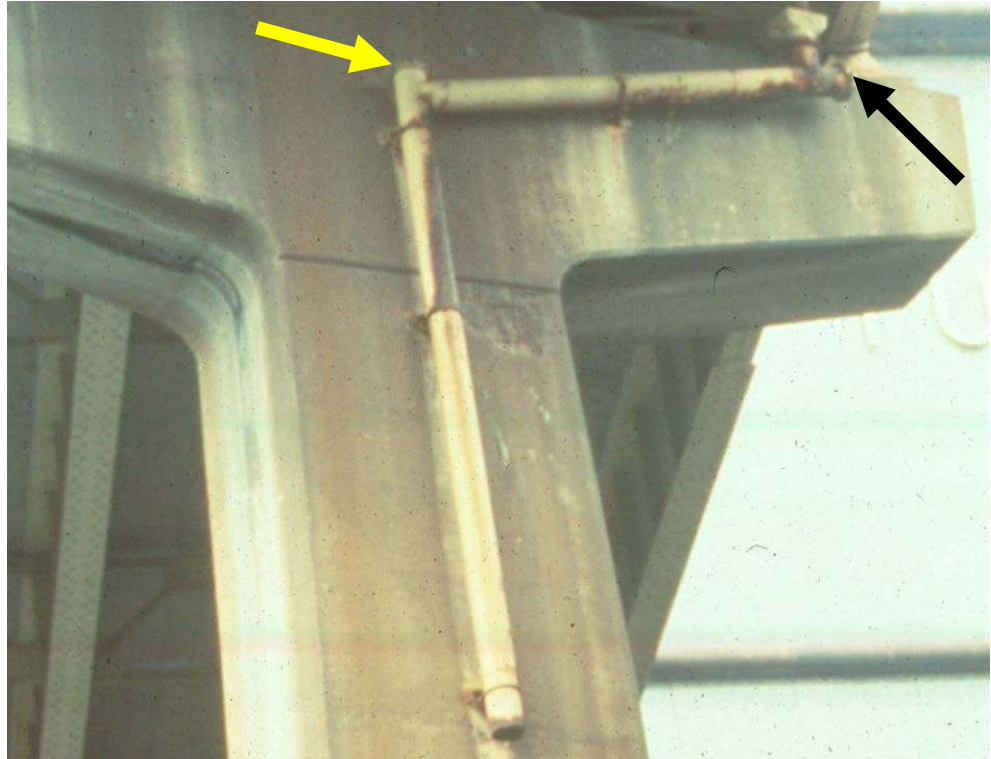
Outlet Pipe with Cleanout Plugs
